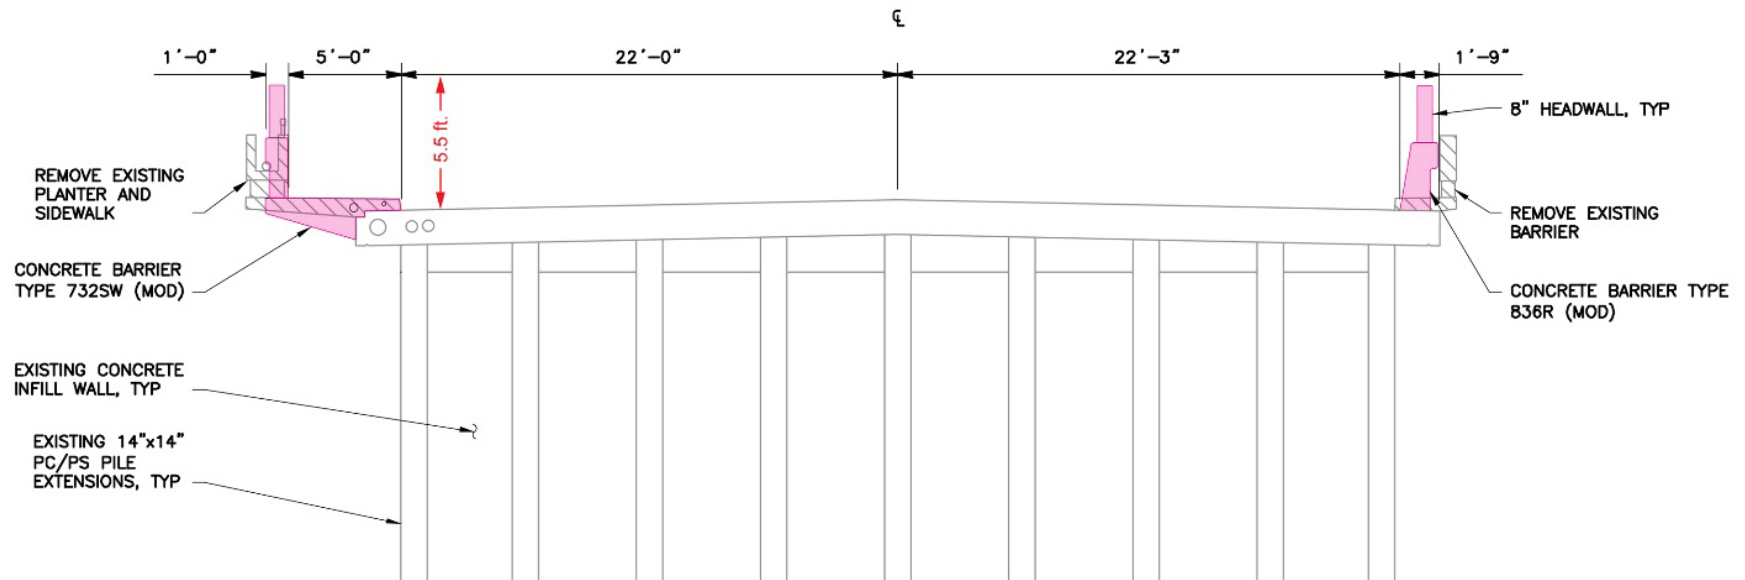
Cross Section of Charcot Avenue Bridge Reinforcement and Improvements
